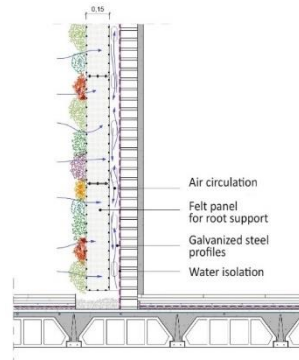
Modular Living Wall Detailed Drawing (URL 18)
